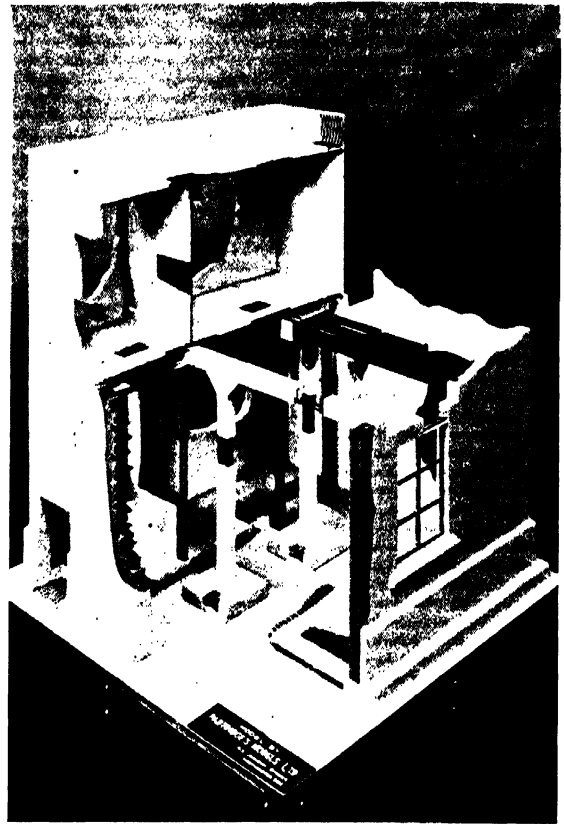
SECTIONAL MODEL TO SHOW CONSTRUCTIONAL DETAILS OF A FERRO-CONCRETE HOUSE
